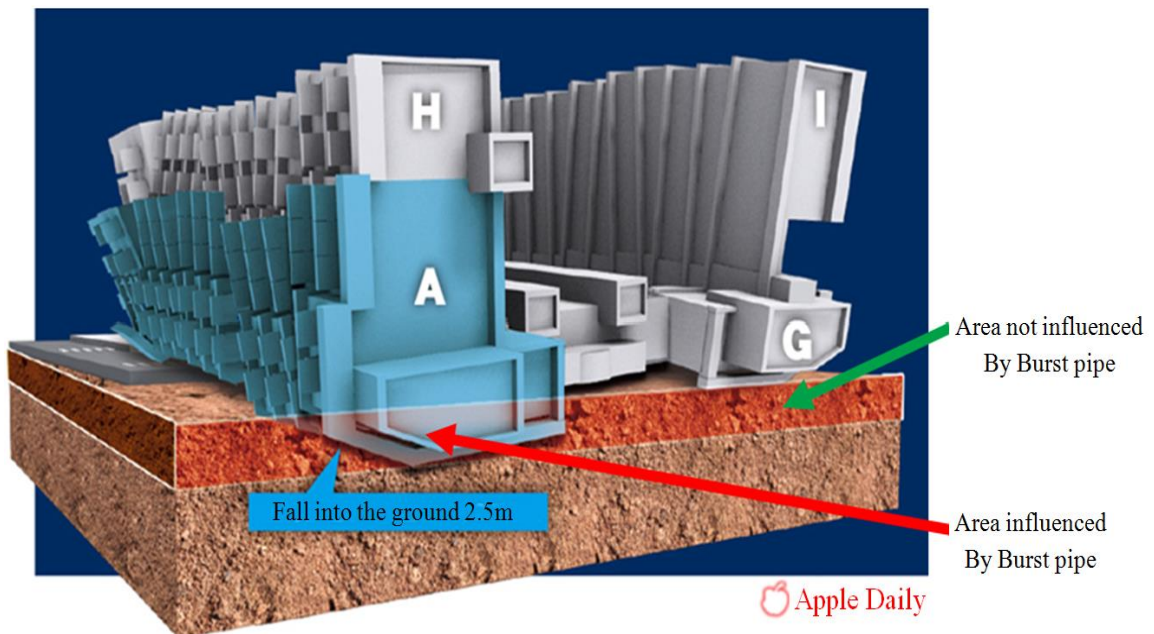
Structural model of the Weiguan building after the collapse (Apple Daily, 2016)
